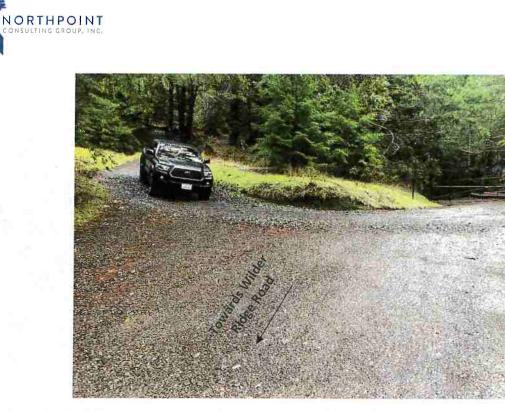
RP 7. Intersection of two private access roads leading from Wilder Ridge Road. Phot taken facing south.
